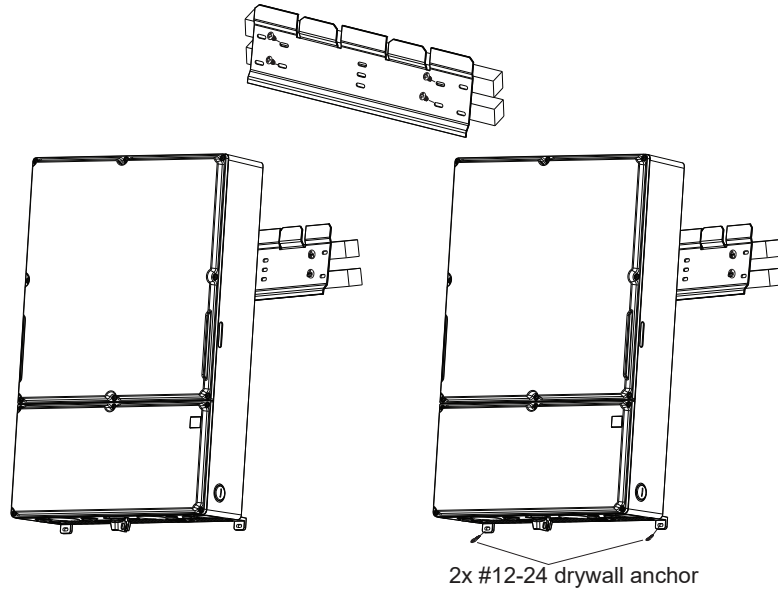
Installing the plate and GM Energy Inverter on a wood stud wall
